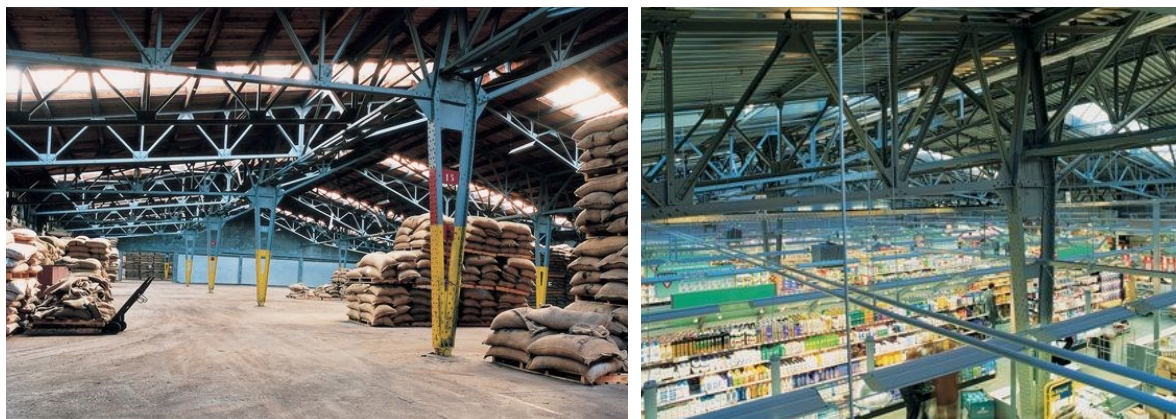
Original steel structure of Argentinian Warehouse (left) and reused steel structure in Brazilian Shopping Center (right), Amsterdam [99]
